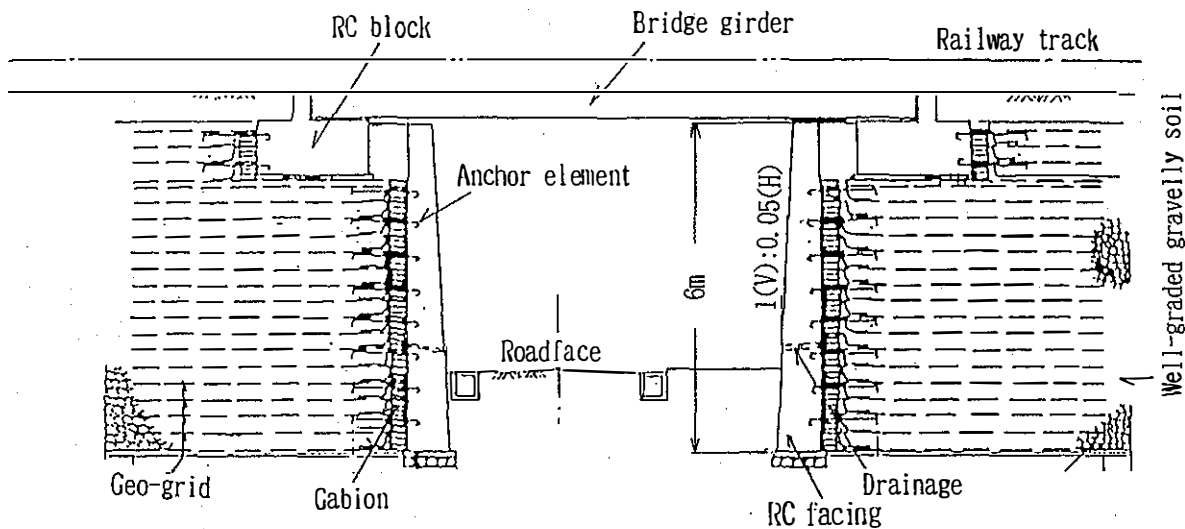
Cross-section of geosynthetic-reinforced soil bridge abutments
